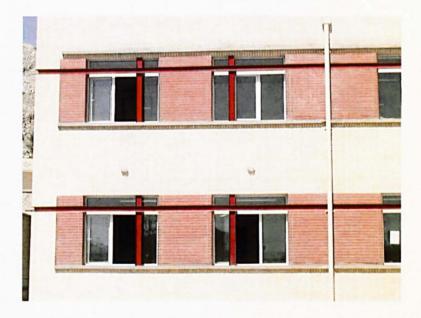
The main façade and classroom windows, Photo © F. Ai
